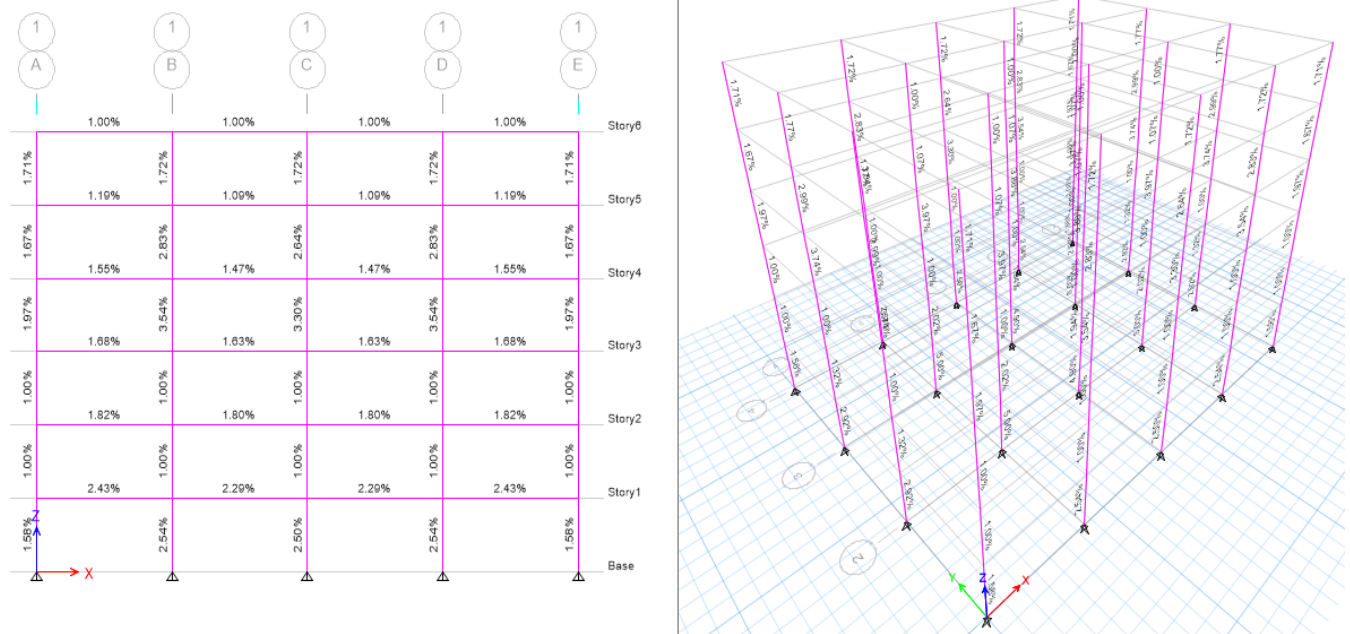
Output Design of the 6-Story Structural Building Showing the Required Reinforcement Area (mm) with Beam A (50cmX45cm),Beam B (40cmX40cm).
